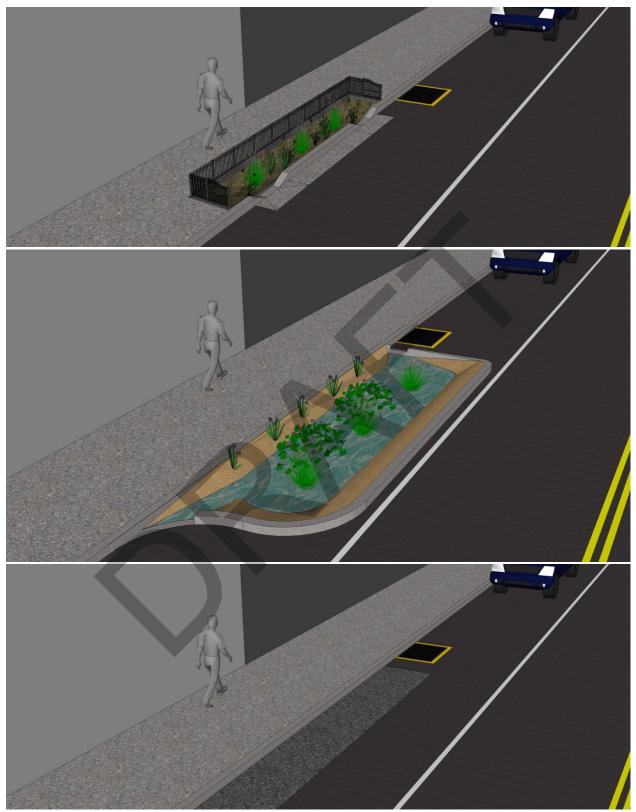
Conceptual illustration of narrow bioswale (top), bump-out bioswale (middle), and street-side permeable pavement (bottom) to address narrow sidewalk constraints
